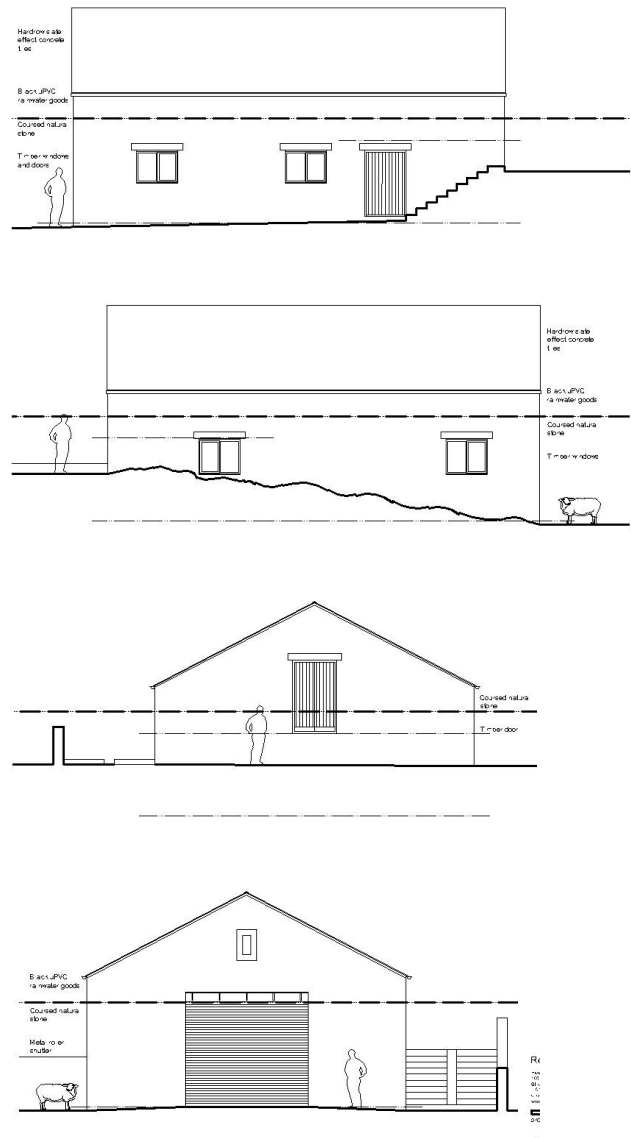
Elevations of the existing building: West (top) East (upper), South (lower) and North (bottom)
